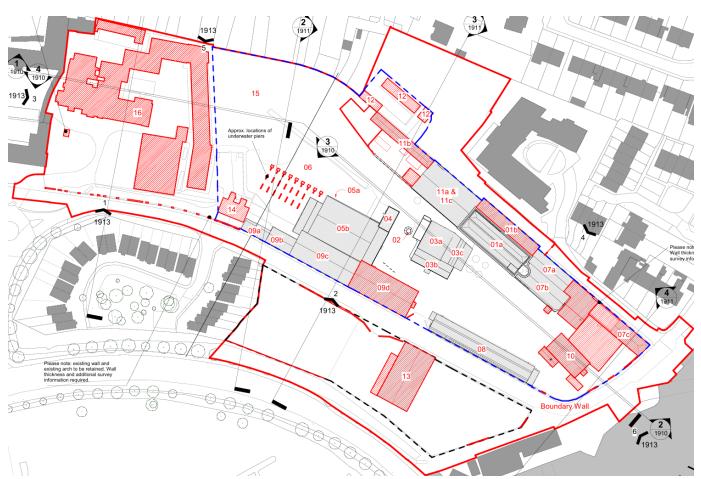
Buildings Proposed for Demolition highlighted in red with buildings to be retained identified in grey.
